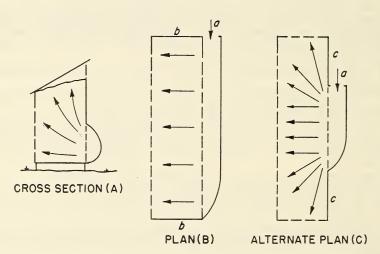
Preparation of a frame single crib for ventilation. Cross section (A) with floor plan (B) and alternate floor plan (C) shown. End walls of crib should be covered as shown at b or side walls as shown at c. Plan (B) is recommended over alternate plan (C). A double crib can be prepared in this manner when it is desired to dry only one crib at a time. Air blown in at a will escape through the crib as indicated by arrows.
